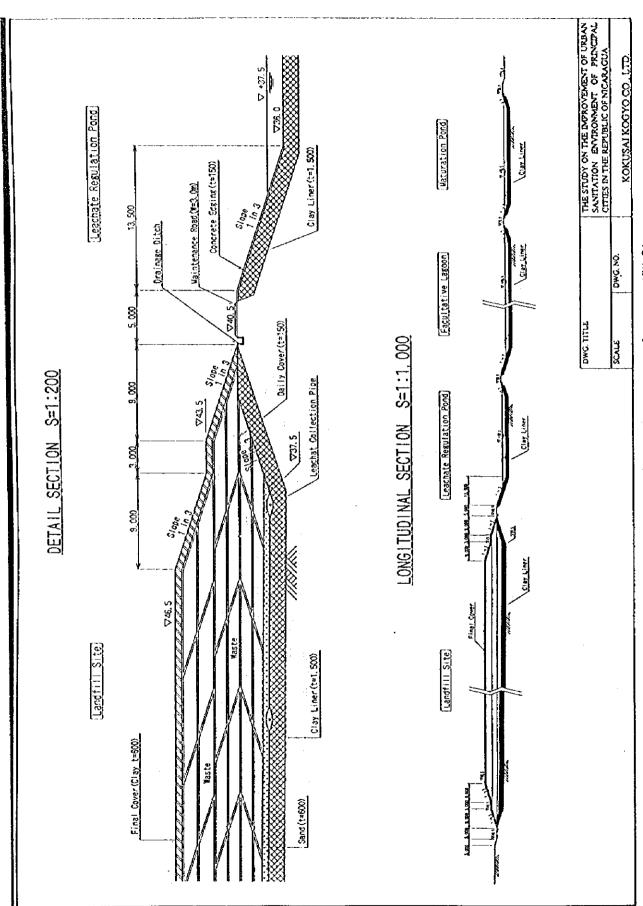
Detail and Longitudinal Section of SVJ Landfill Site
